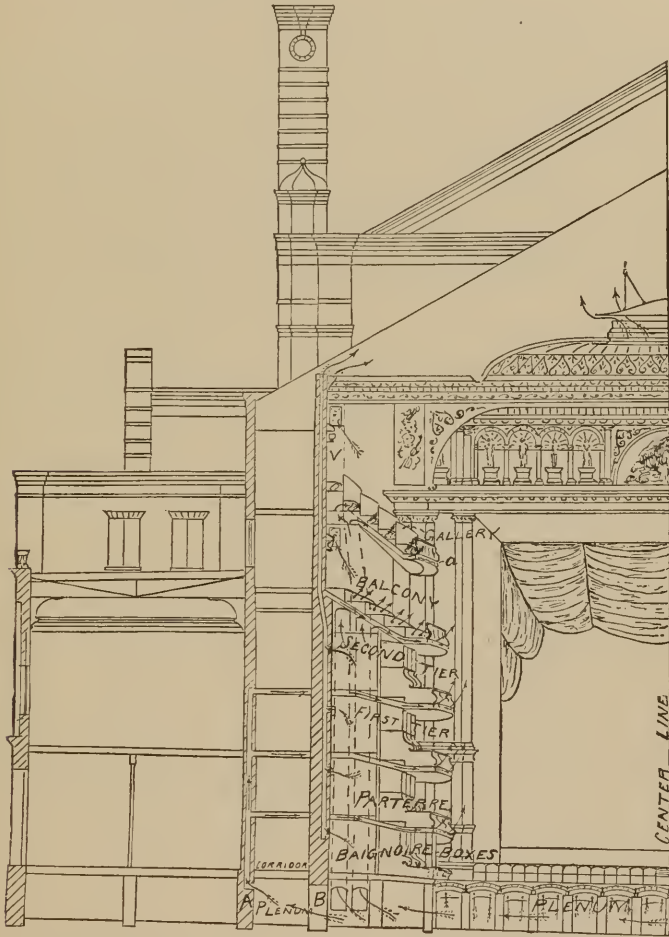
METROPOLITAN OPERA HOUSE, NEW YORK CITY.—TRANSVERSE SECTION.
